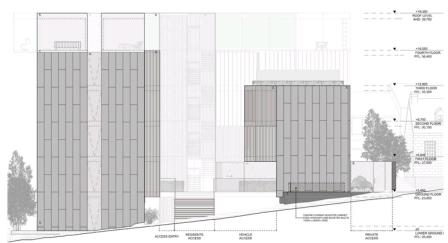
The Wilmot Street (Western) Elevation of the proposed development (Source: Room11 Architects).
